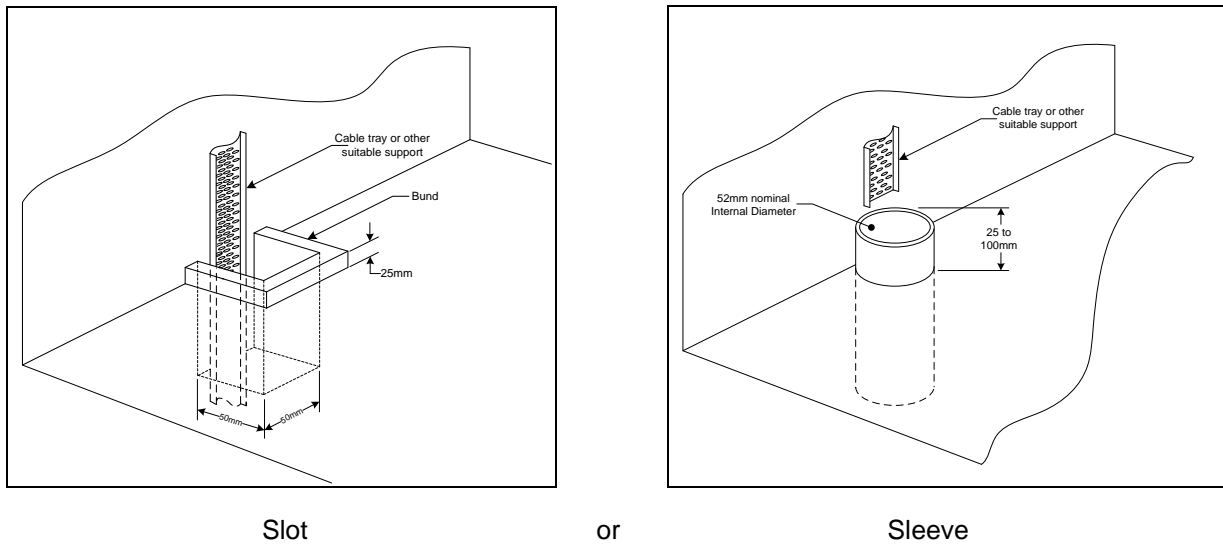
Telecommunications Riser/Closet Floor or Ceiling entry
